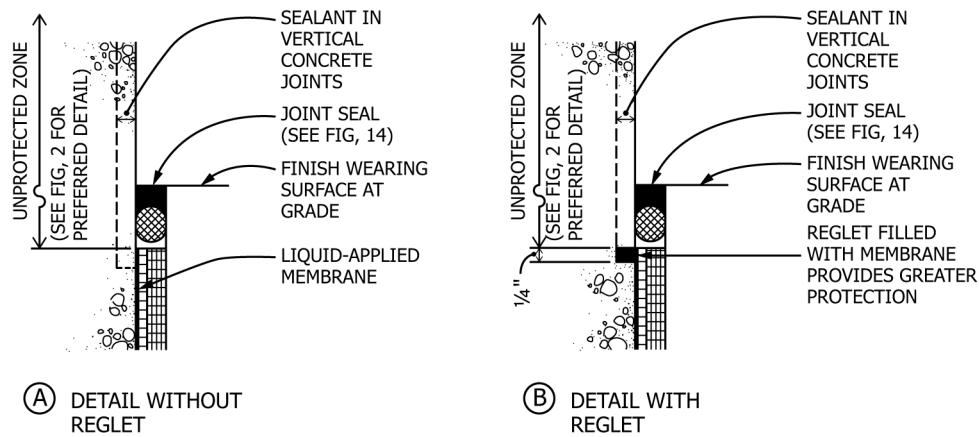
Terminal Conditions on Concrete Wall Below Finish Wearing Surface at Grade (see 7.6.1)
